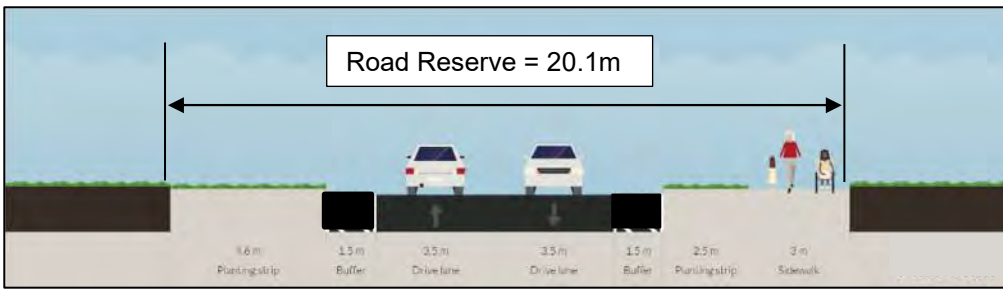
Proposed Cross Section for Lamb Street and Cambridge Road
